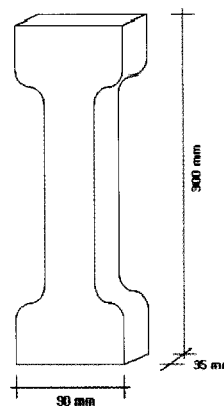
Specimens cut to form bone shapes to prevent end crushing.
